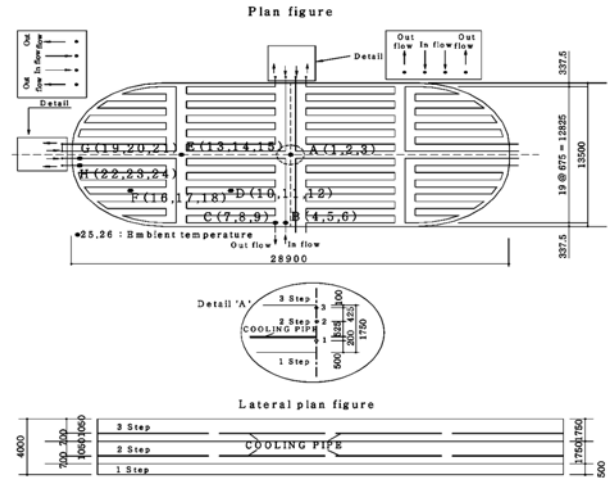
The thermocouple installation plan & detail chart of pier (unit : mm)
